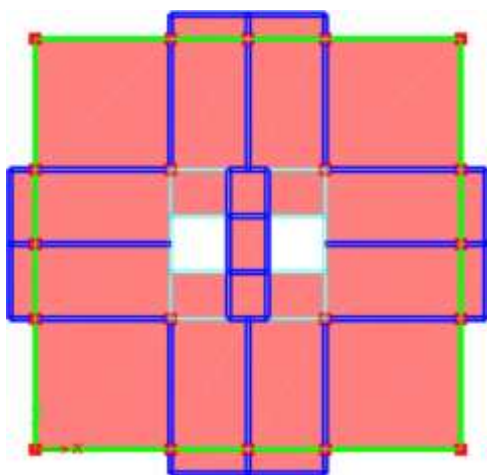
Floor plan of external steel beam-concrete column hybrid structure
